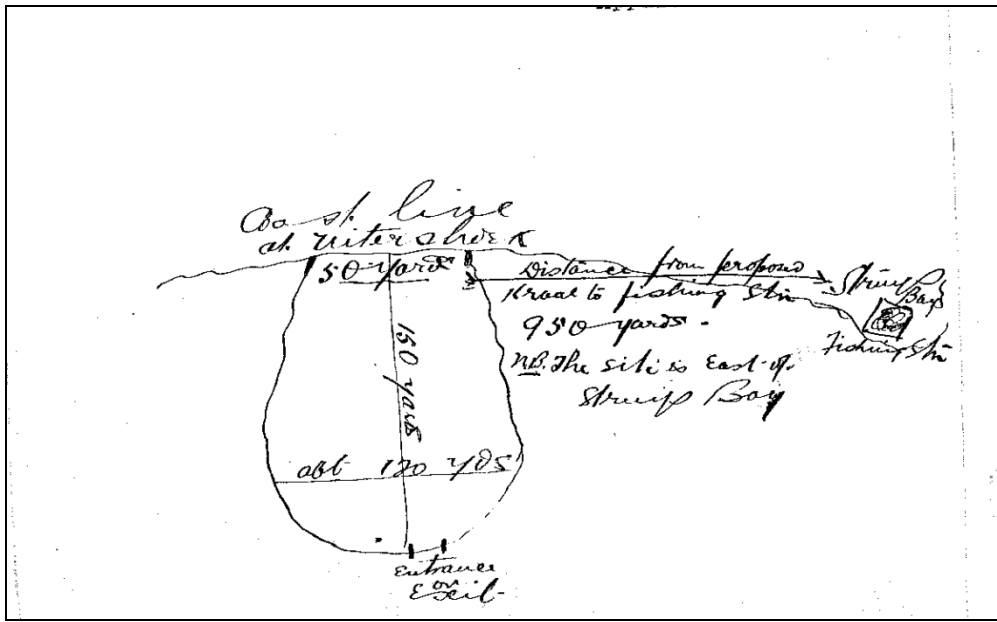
Plan of Fish trap of M. D. van Breda at Bilers Hoek, Struis Bay. Cape Archives. PAN 55. K13/12.
